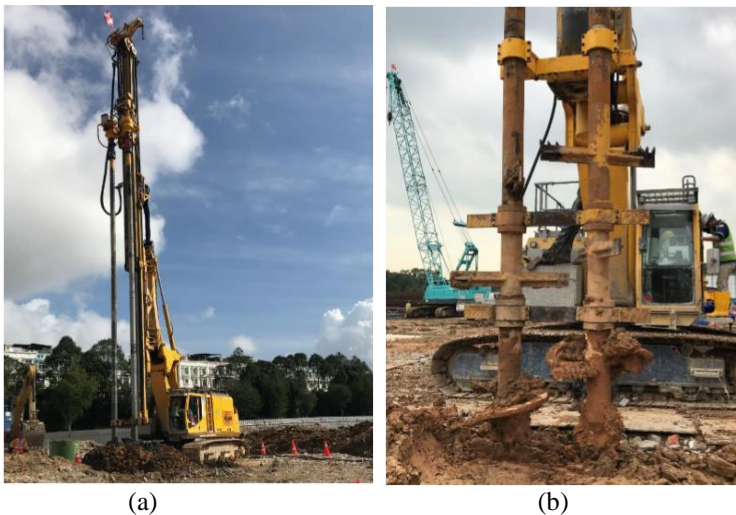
Dual shaft deep mixing rigs used for tunneling project at Bedok South, Singapore (source: Keller ASEAN)
